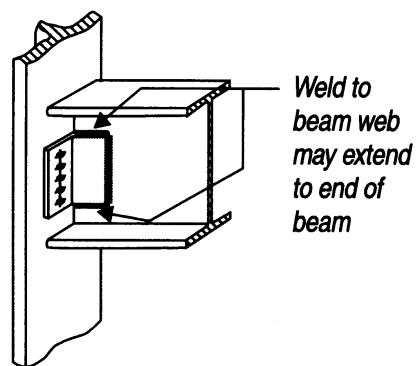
Fillet weld details on framing angles.
